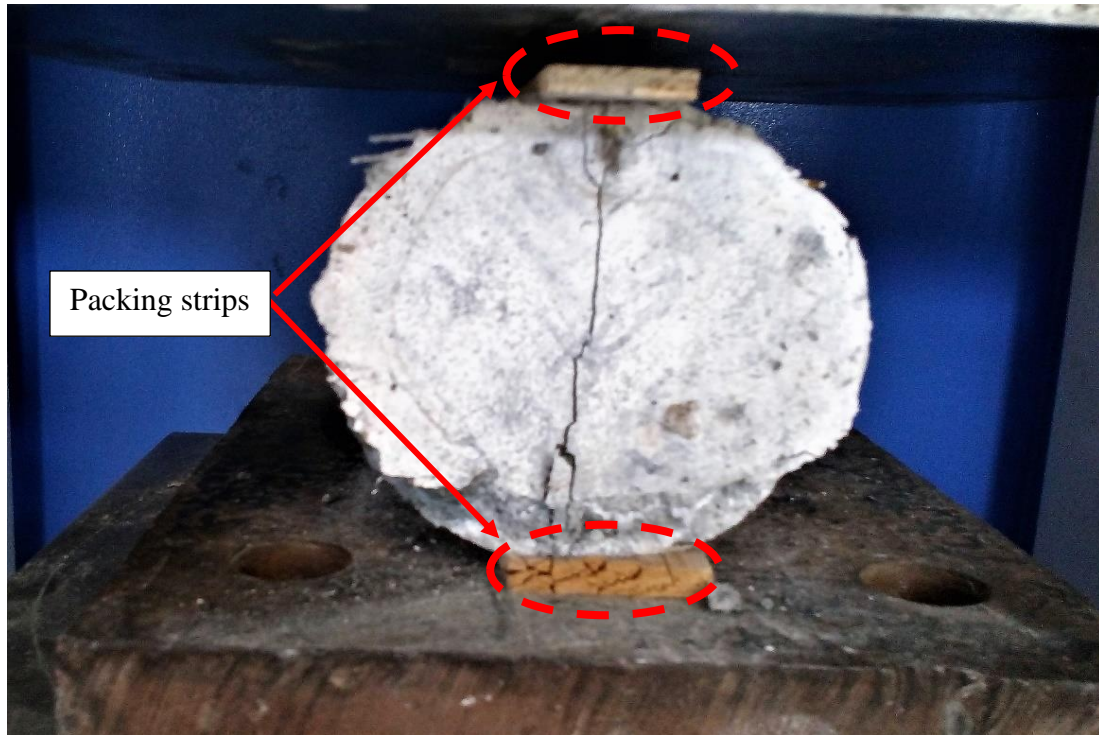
10: Arrangement and testing of cylindrical specimens in CTM.
